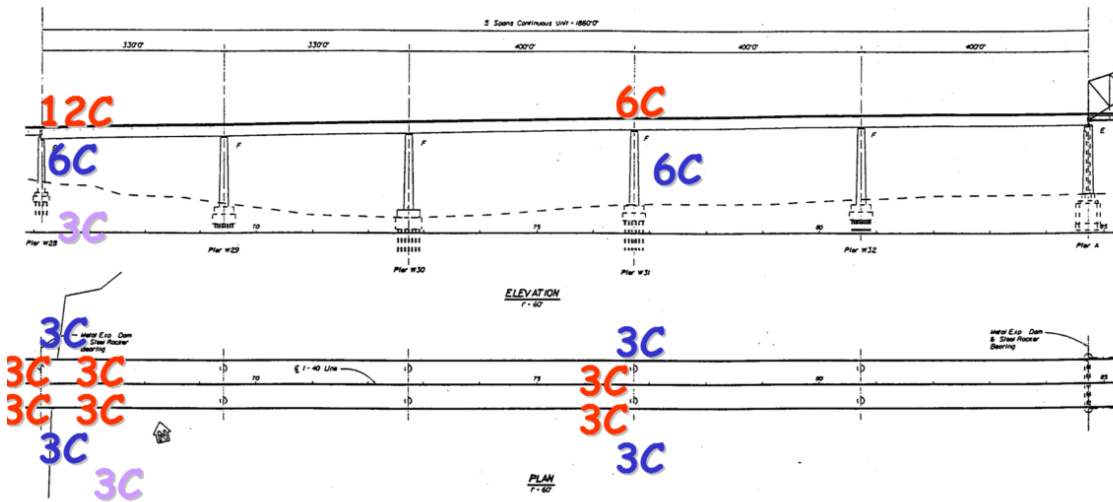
Sensor locations on the west approach to the I-40 Bridge.
